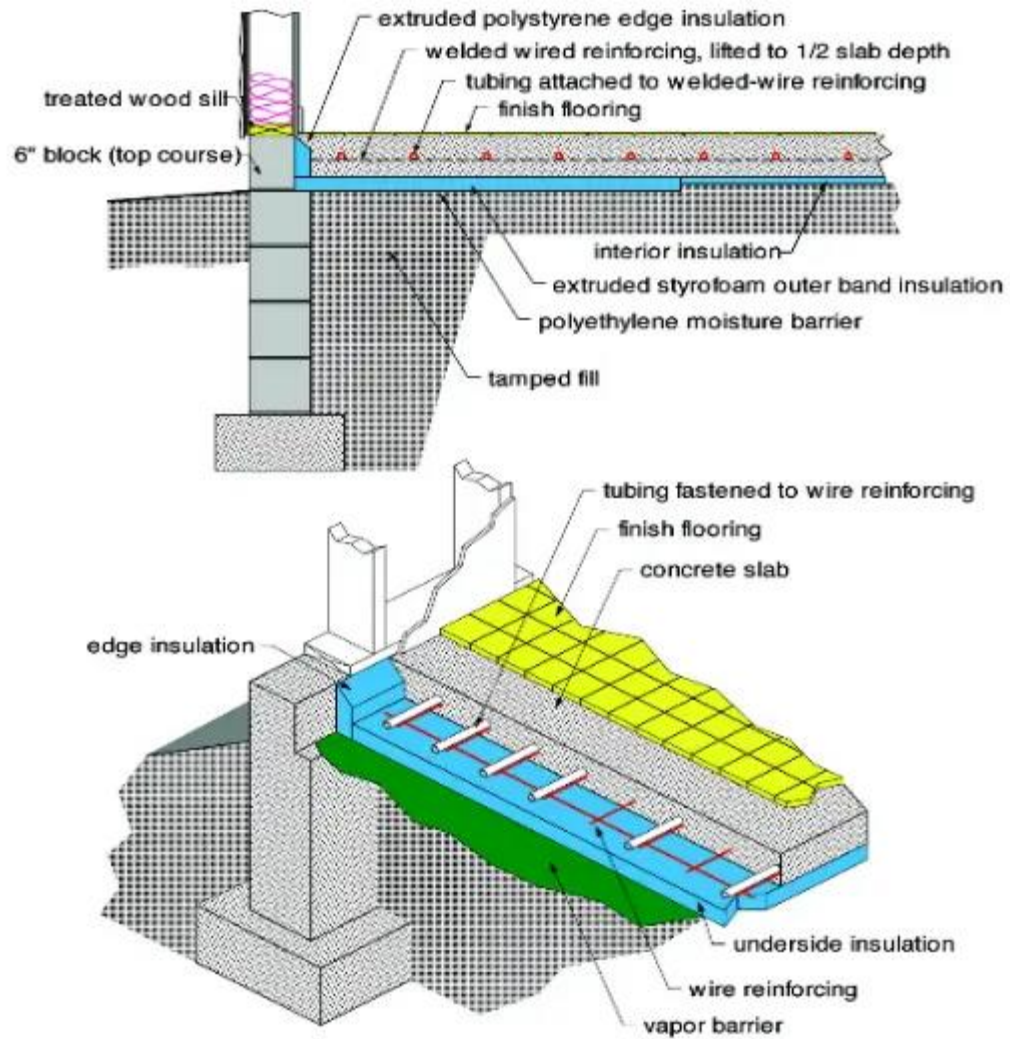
A floor section detail explaining the installation of a thermal comfort floor section which can be included in all the academic buildings.
